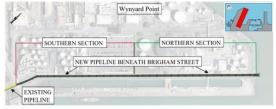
Plan View of the Brigham Street - Distinguishing Between Southern and Northern Sections
